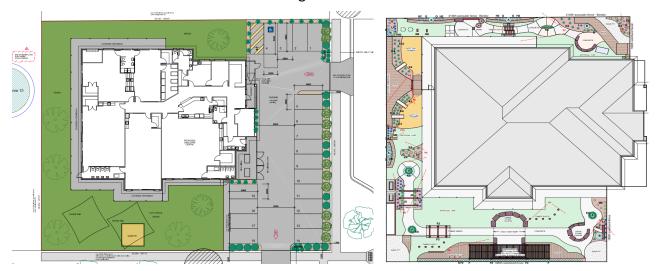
Original approved landscape plan (left) and the as constructed landscaping (right)
